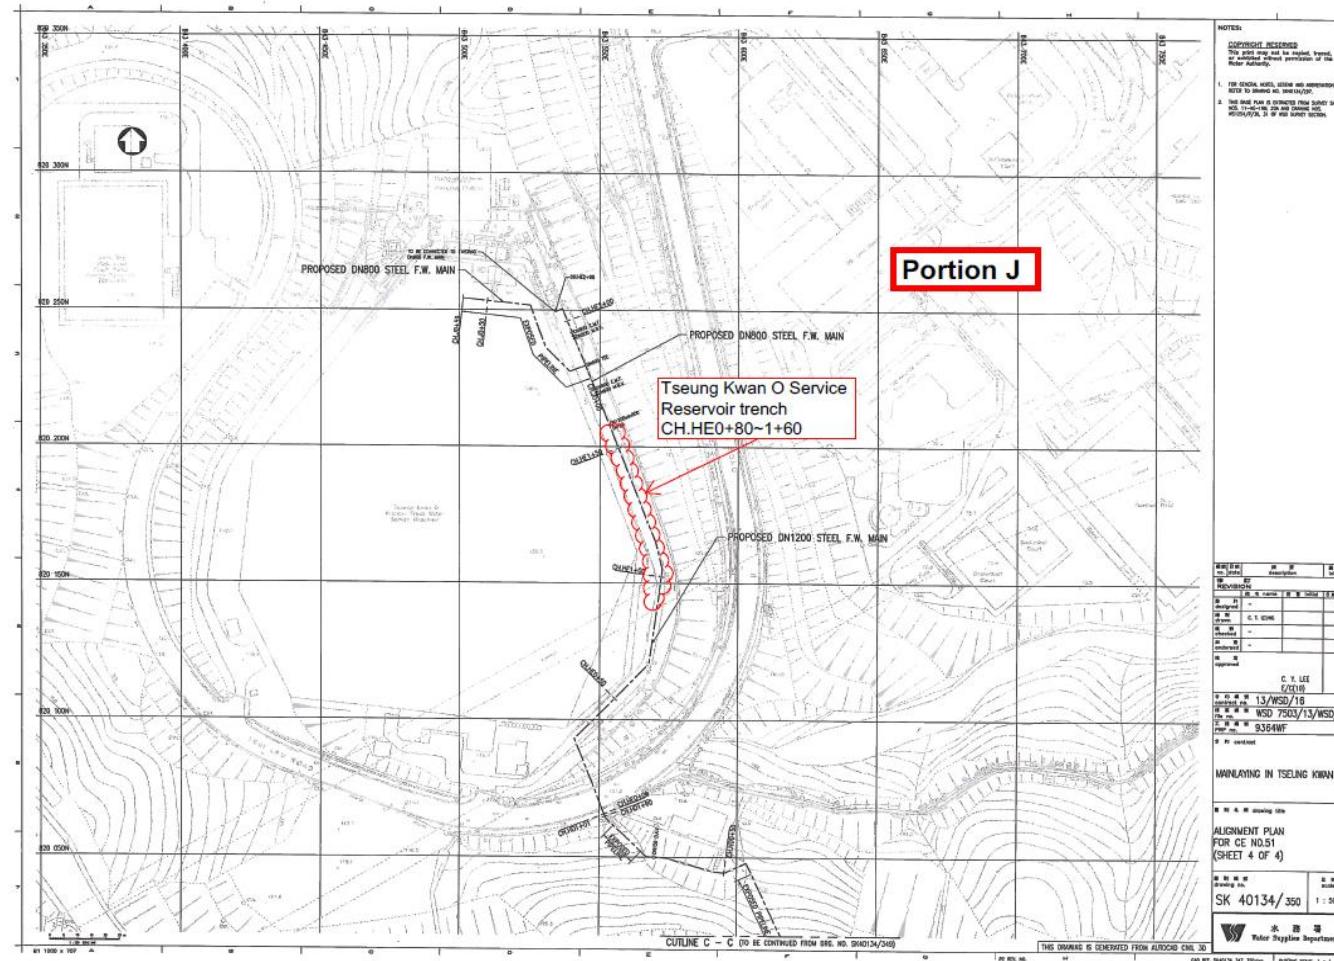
Location Plan for Portion J – CE.HE0+80~1+60
